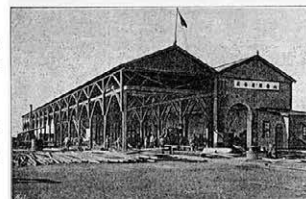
BRICK-BUILDING SHOP AT SHAN-HAI-KWAN.
